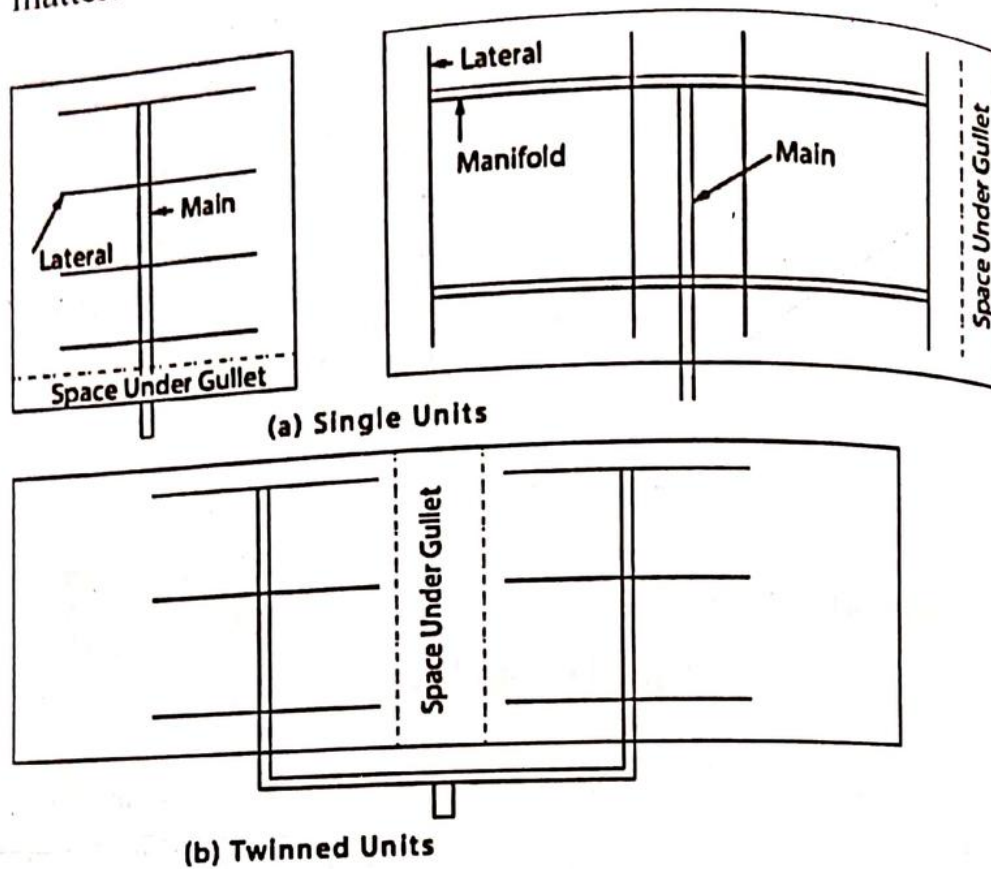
Typical Arrangements of Perforated Pipe Underdrains in Rapid Sand Filter
